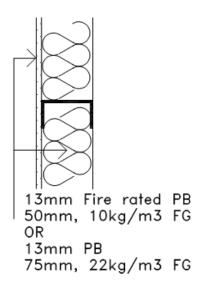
Construction for pipes running through ceiling of habitable spaces
